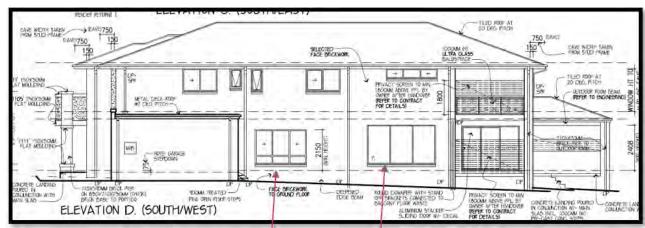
Proposed Elevation D (South-West elevation) window layout with 1.8m high privacy screens to all outdoor areas and conditioned leisure room window.
